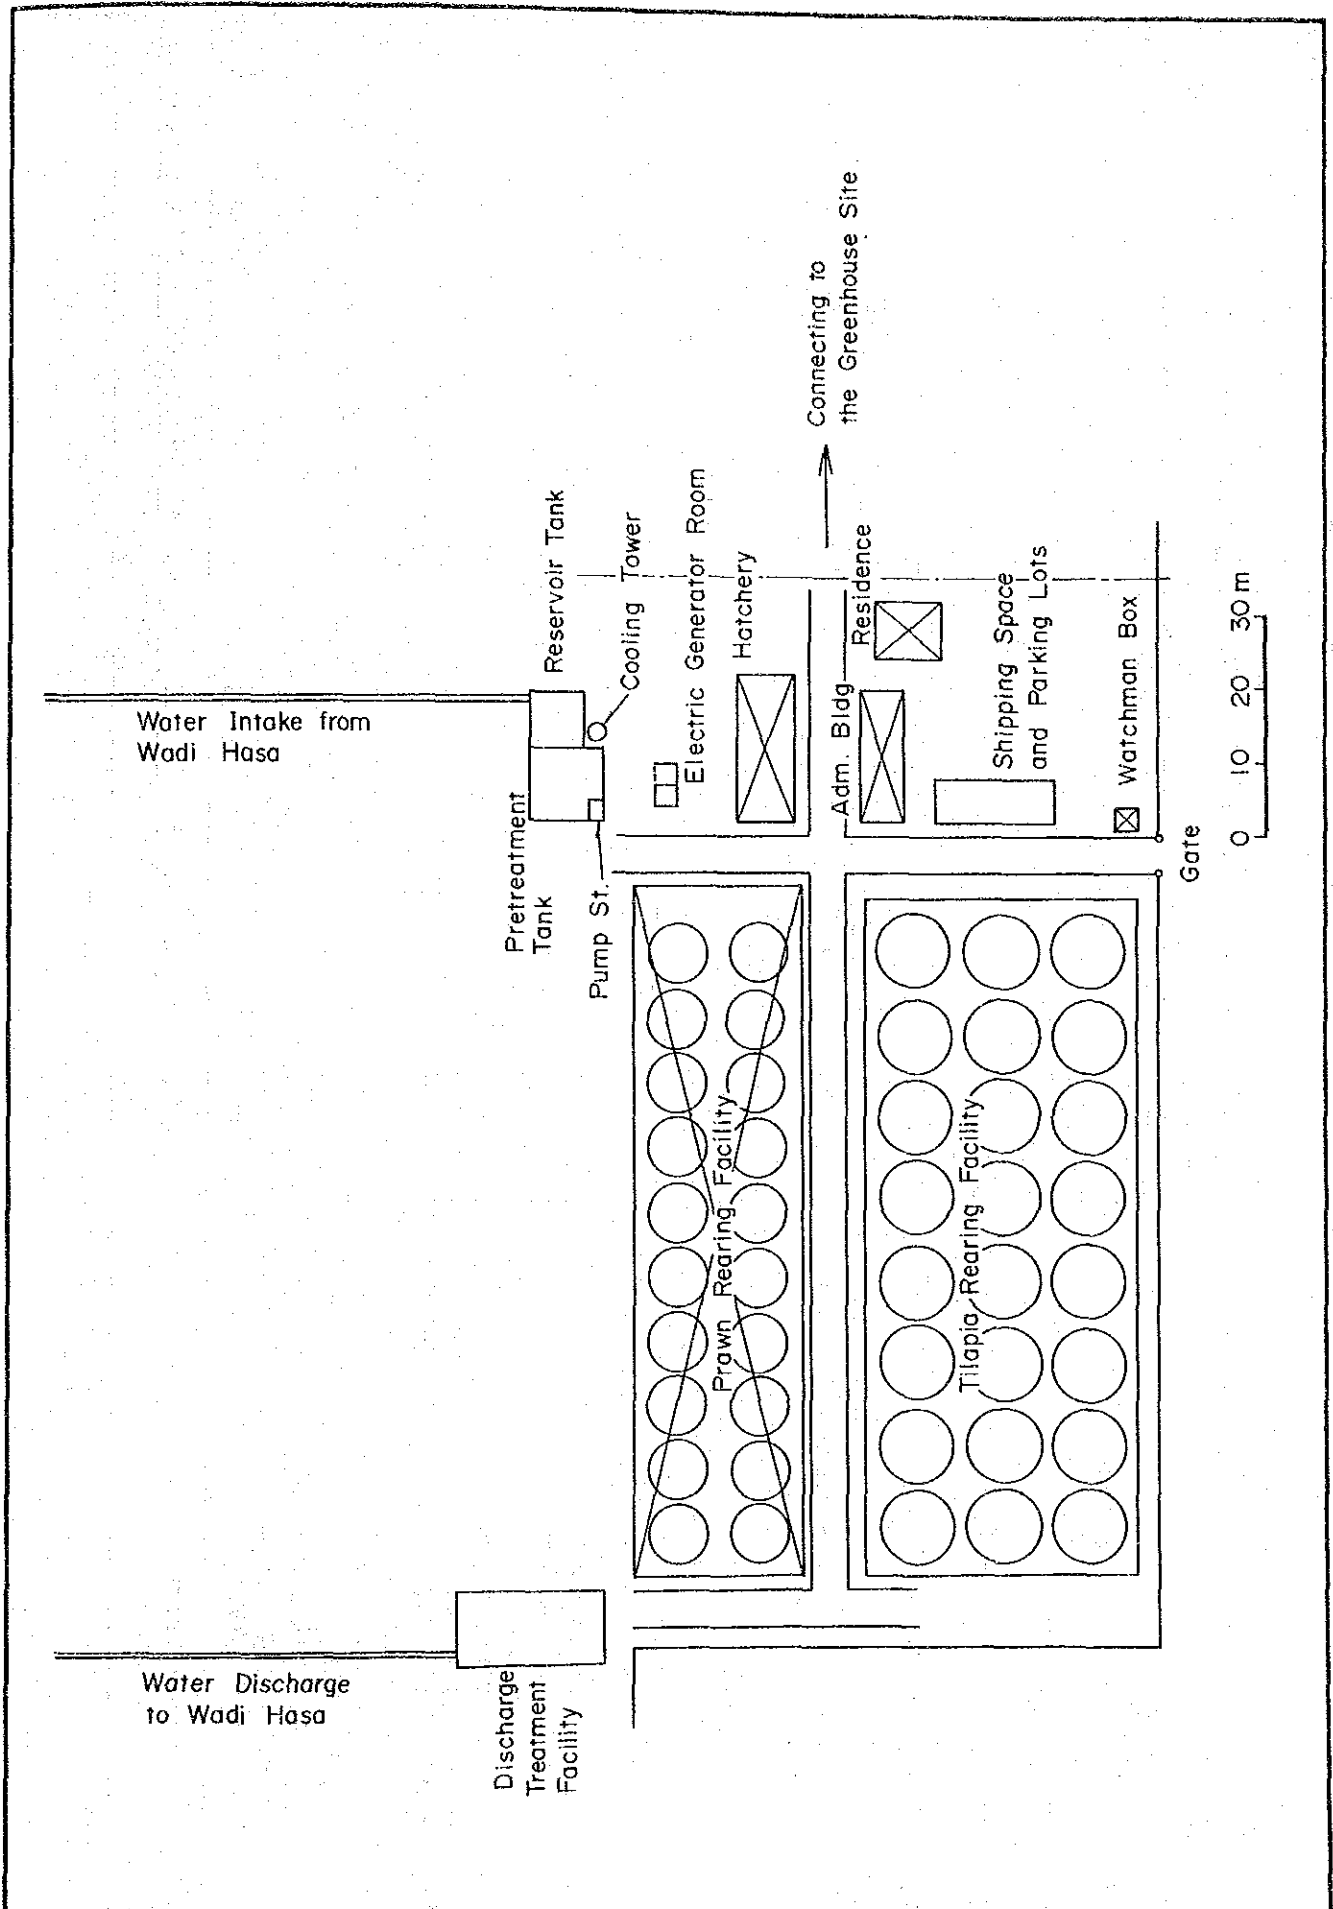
Preliminary Layout of Proposed Fish Plant
